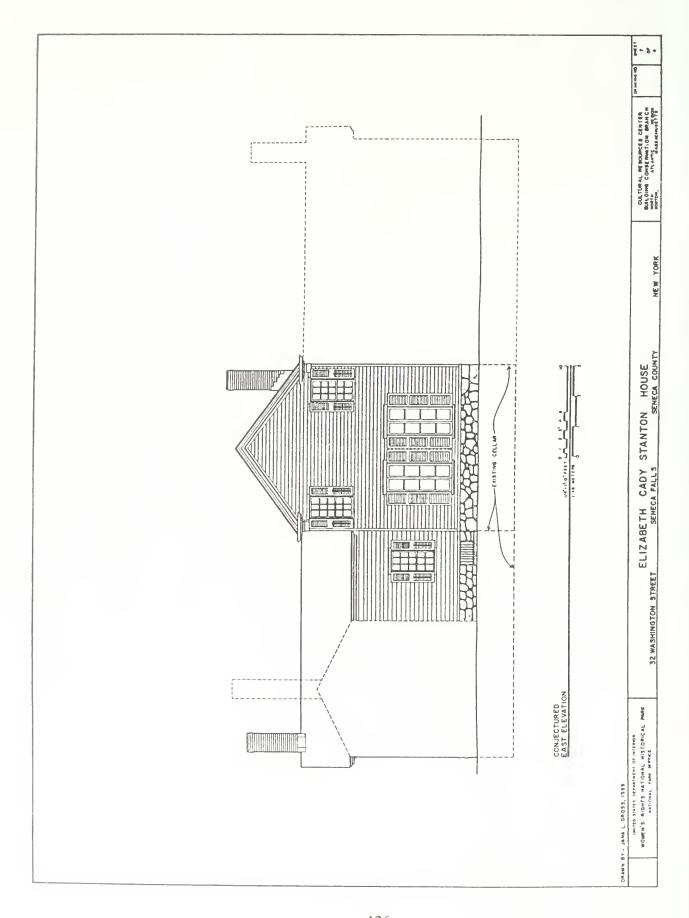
Stanton House: east elevation (conjectural view), circa 1847-62.
